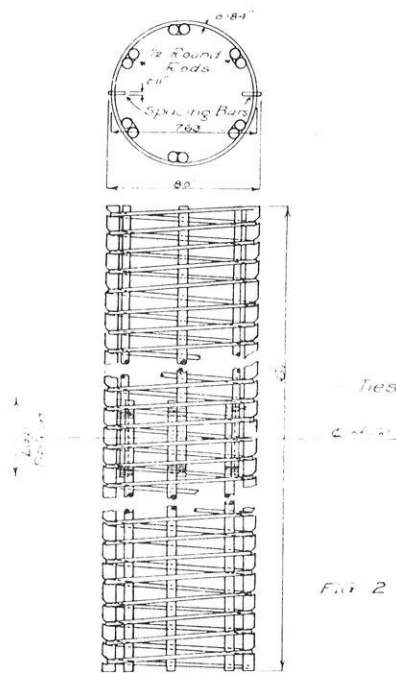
Typical arrangement of longitudinal and hoop reinforcement in a lap-spliced
